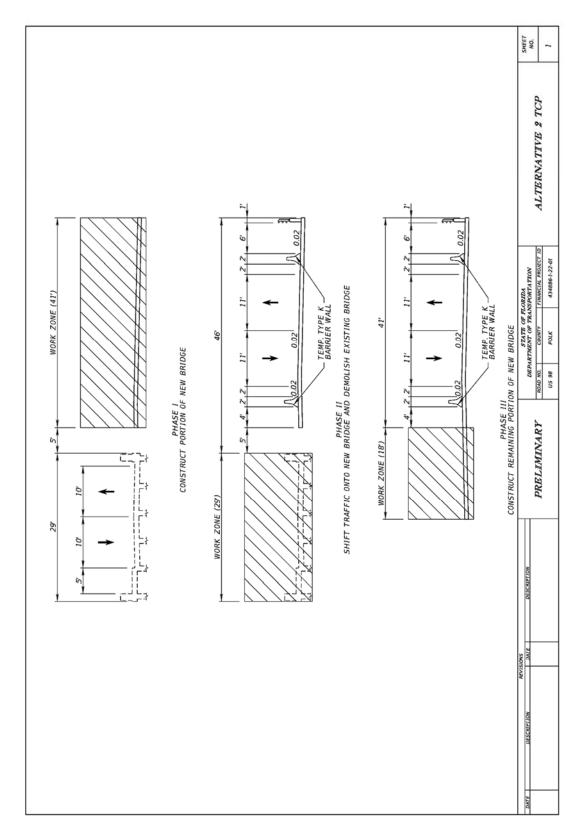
TEMPORARY TRAFFIC CONTROL PLAN FOR THE PREFERRED ALTERNATIVE
